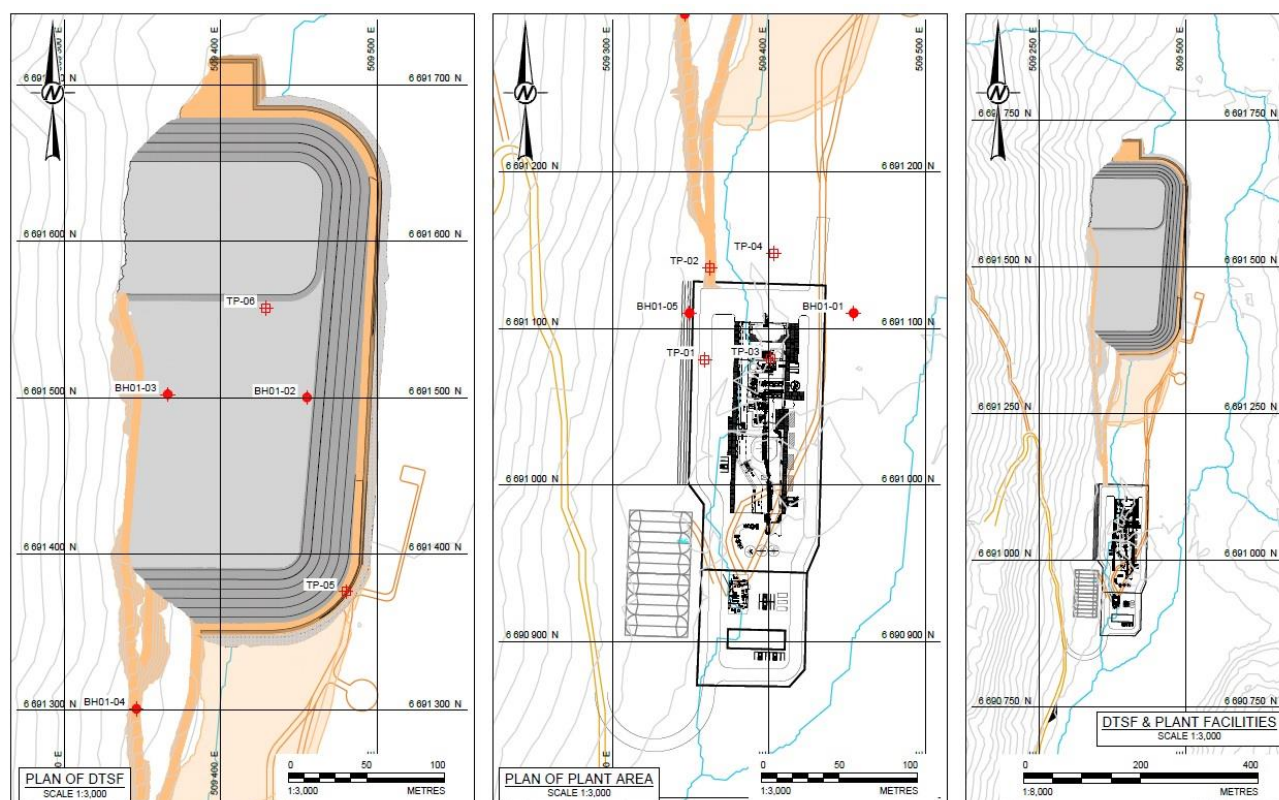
Plan of the proposed process plant site and DTSF site showing investigation points
